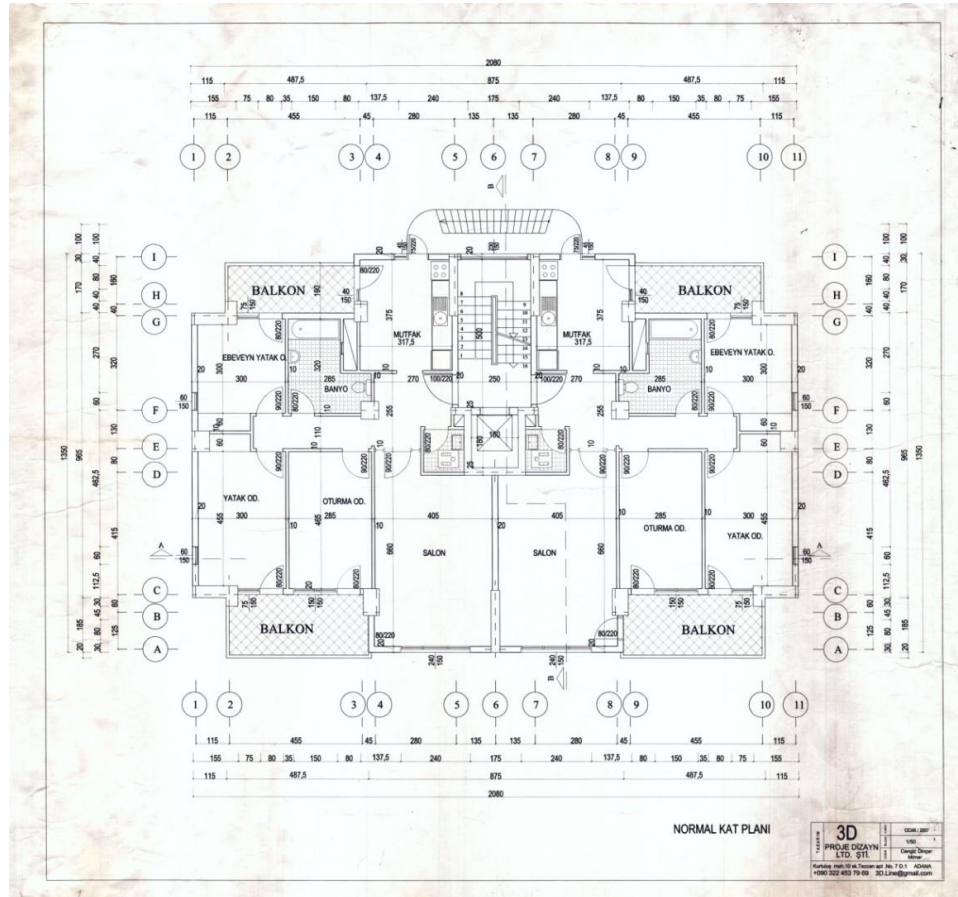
Halk Kent Coop. Standard Building Storey Plan, 2007
